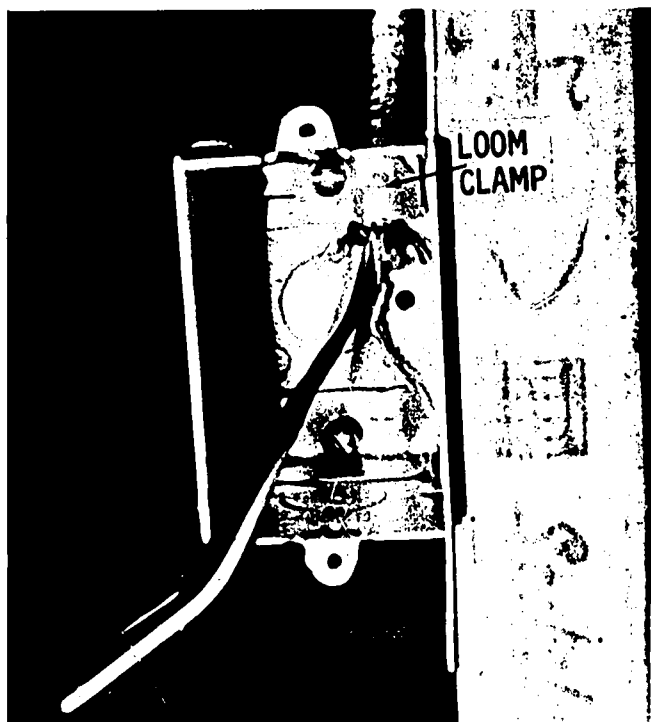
Fastening Romex Cable Under Loom Clamp
